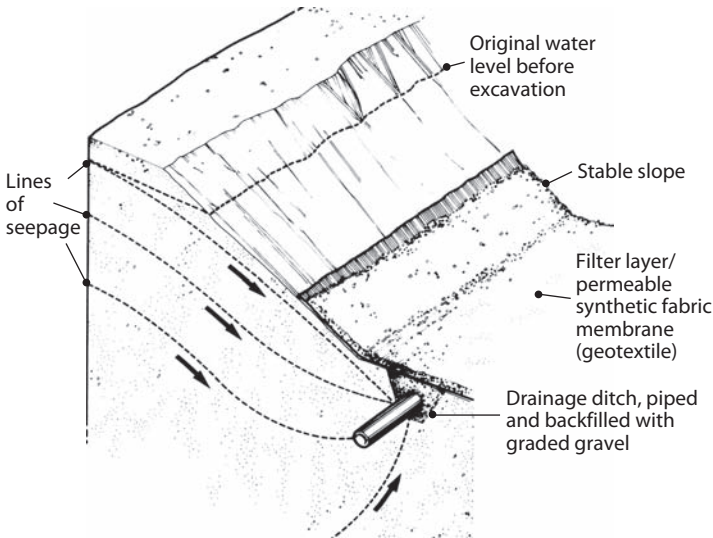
Stable excavated slopes resulting from flat gradient and provision of drainage trench. (From Somerville, S.H., *Control of groundwater for temporary works. CIRIA Report 113*, Construction Industry Research and Information Association, London, 1986. Reproduced by kind permission of CIRIA: www.ciria.org.)
